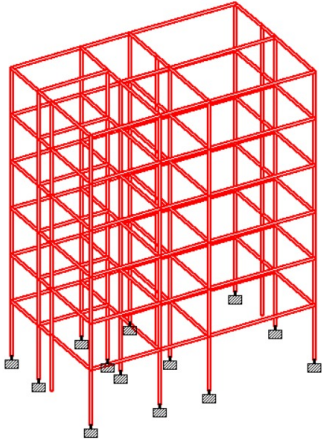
Three dimensional rendered view of the building from STAAD Pro
